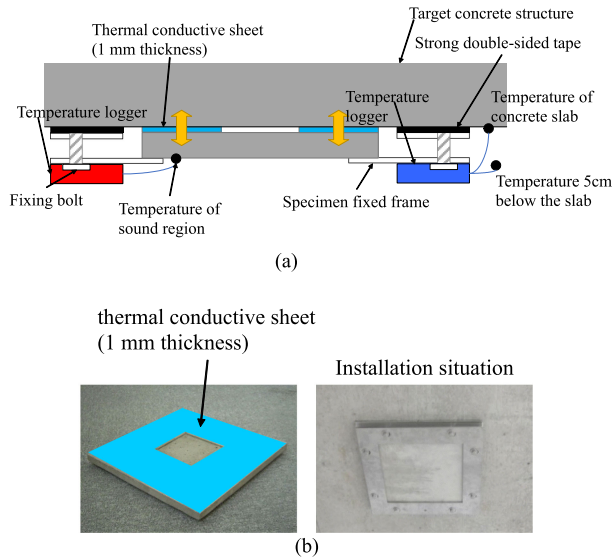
Structure and installation situation of attachable specimen. (a) Structure of attachable specimen. (b) Installation situation.
